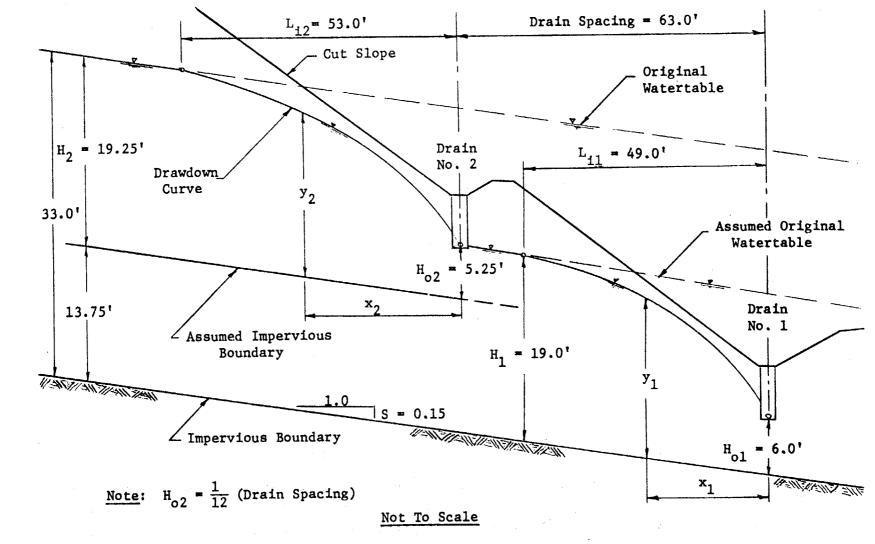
Example No. 22 - Dimensions and details required for the use of Figures 61 and 62.
